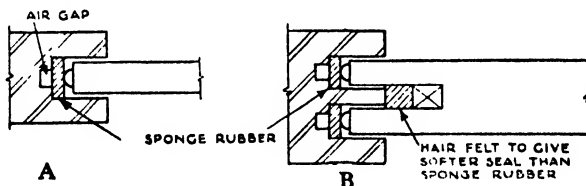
SEAL TO LEADING EDGE OF SLIDING DOOR
